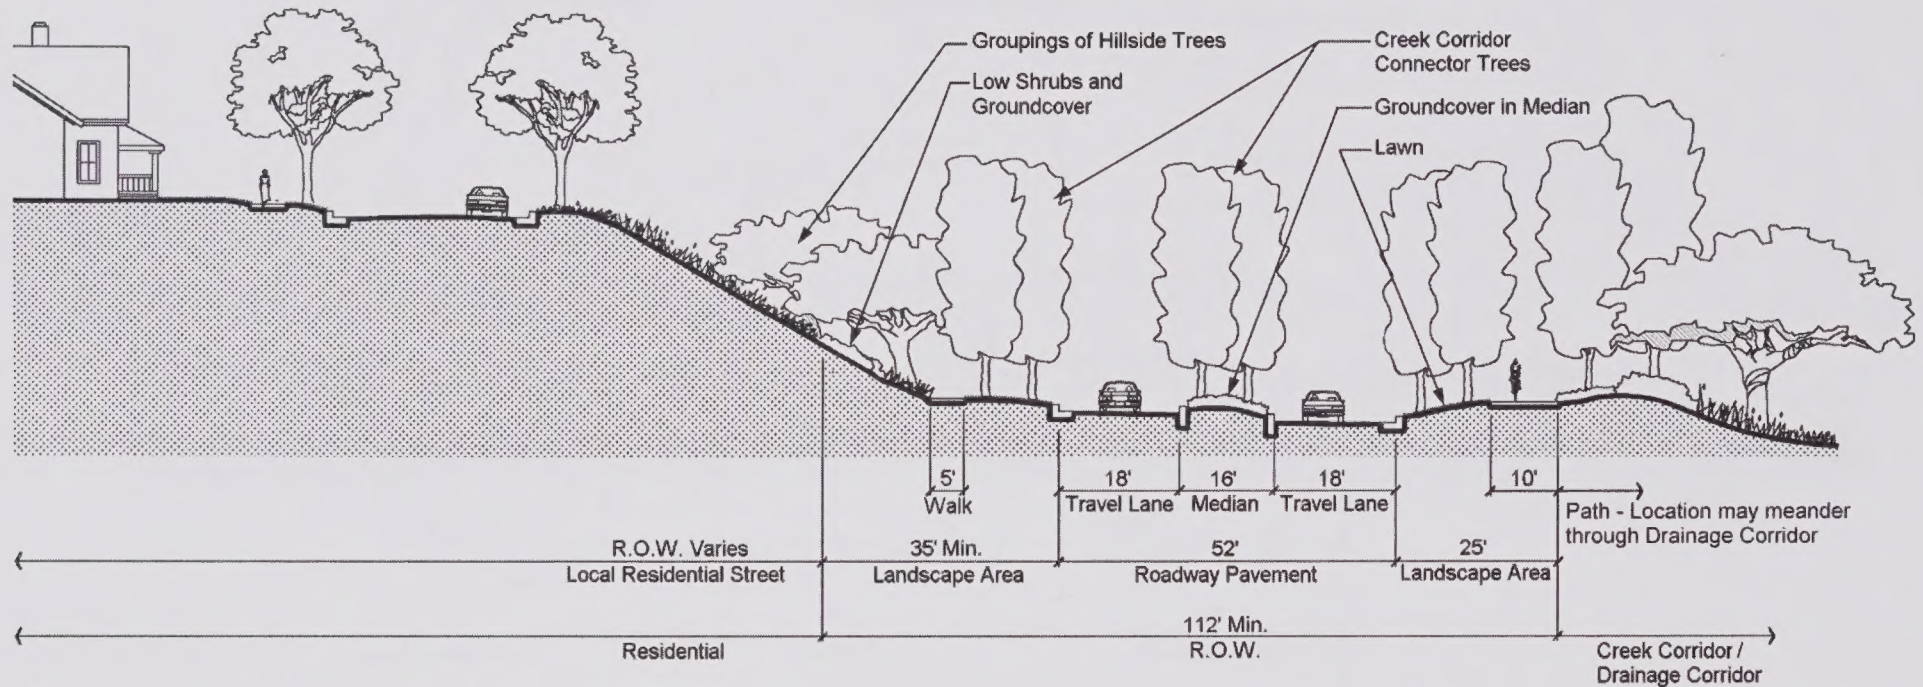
SECTION L – MURRAY RANCH ROAD
